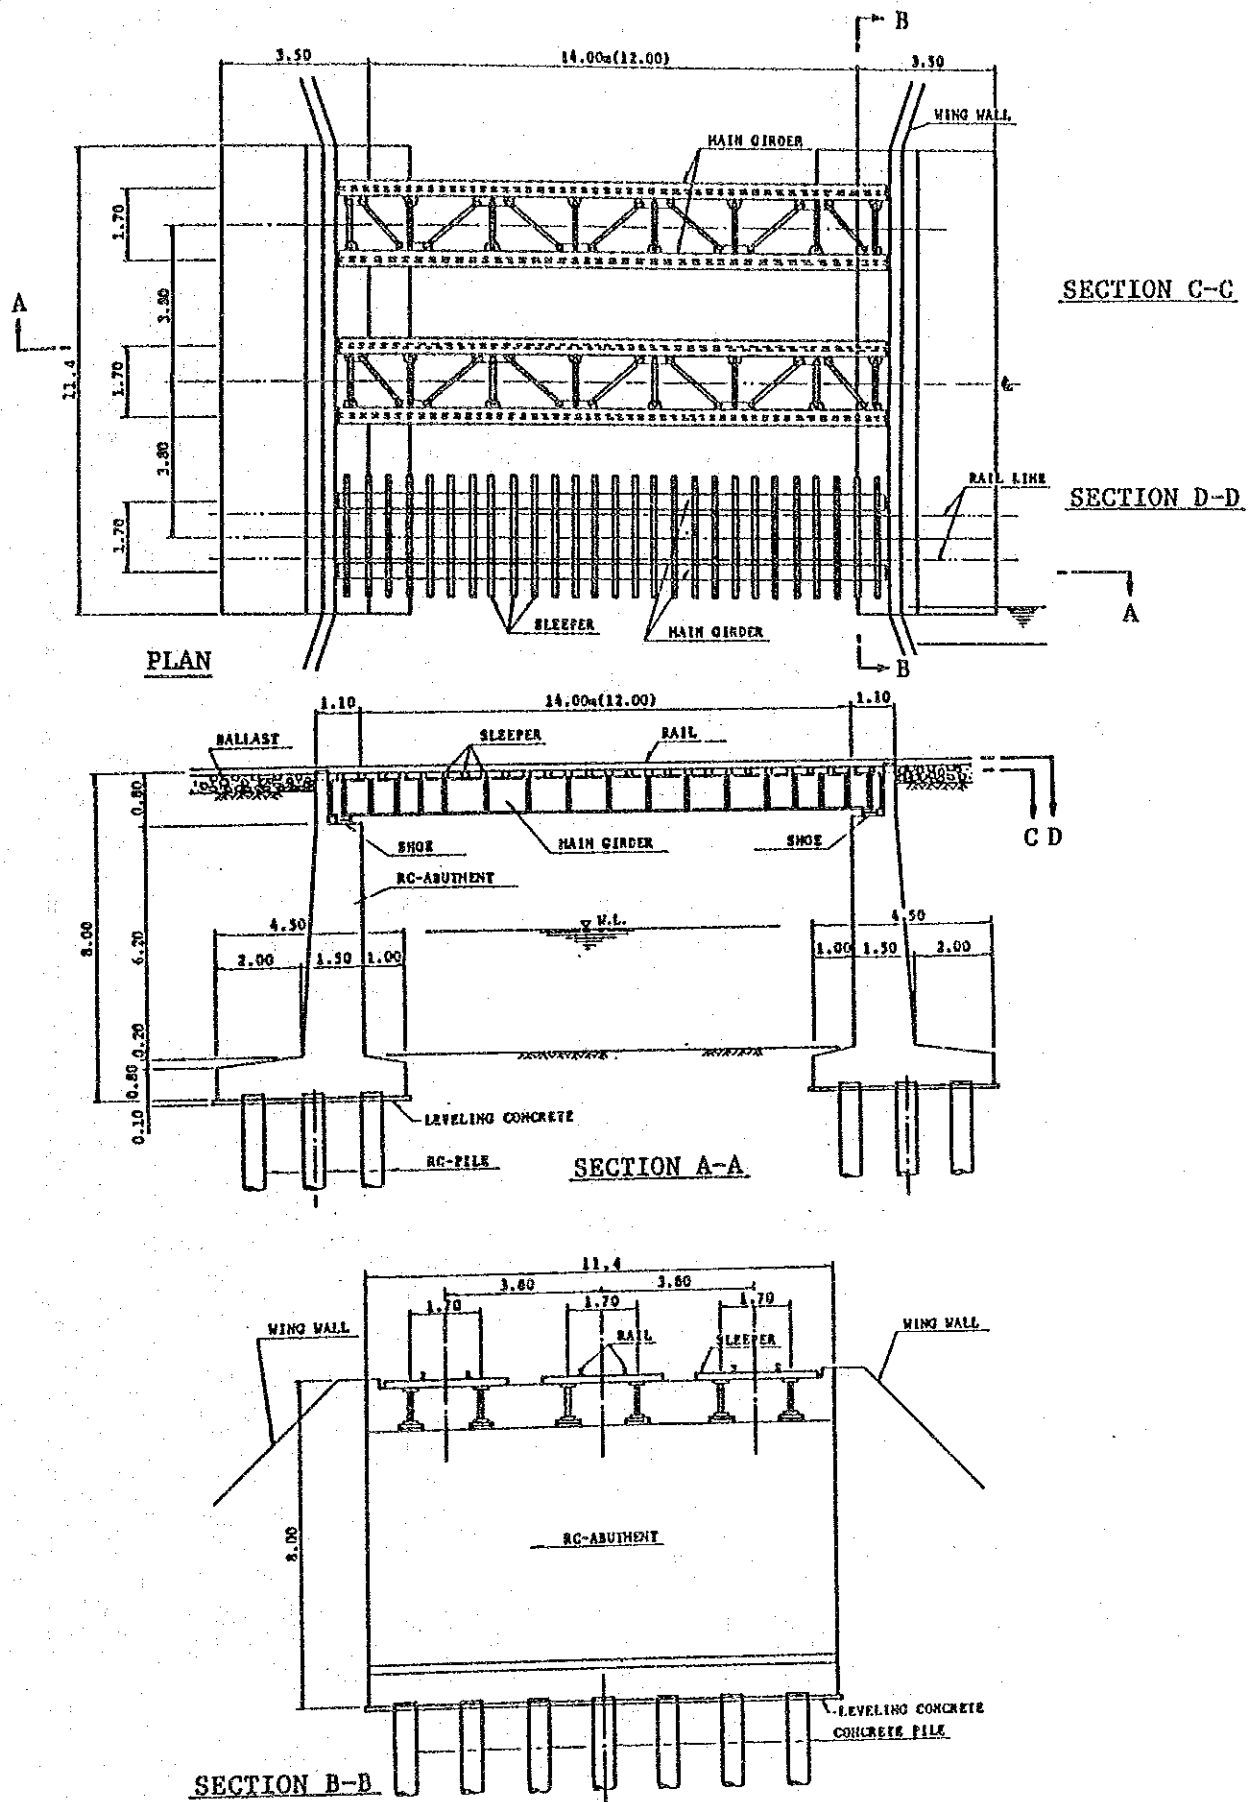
TYPICAL DESIGN OF RAILWAY BRIDGE
